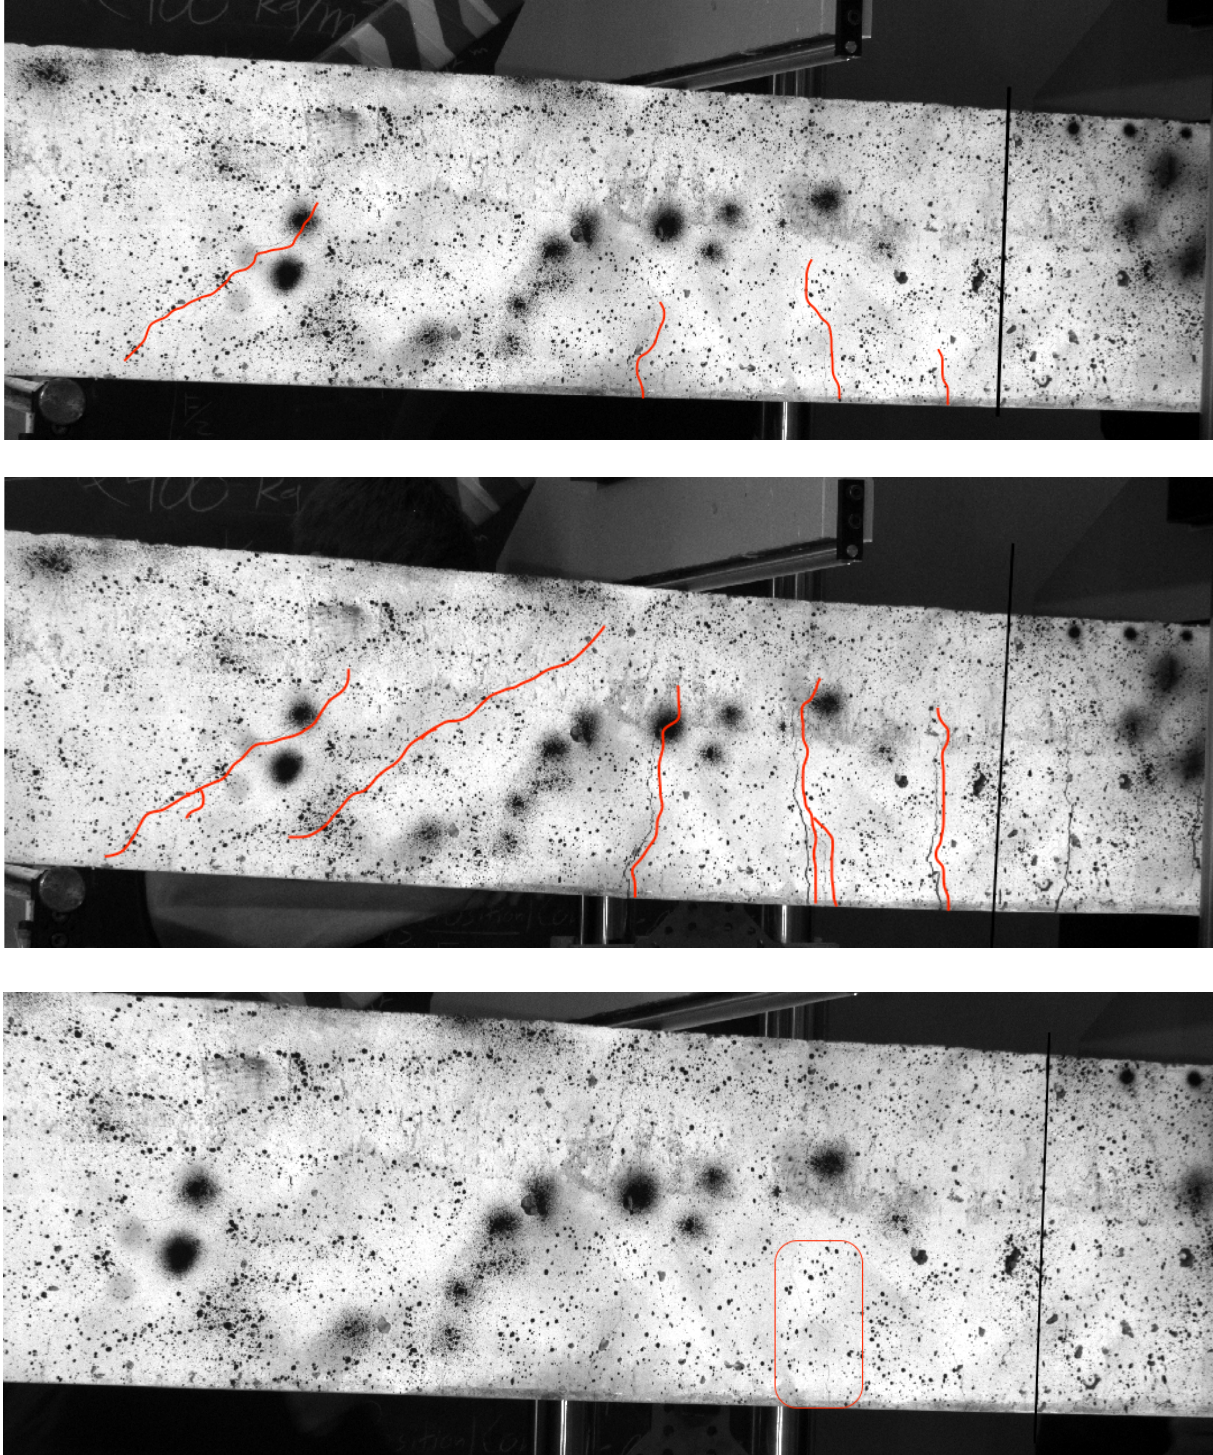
Crack pattern for experimental concrete beam containing 0.5% recycled steel fibres
